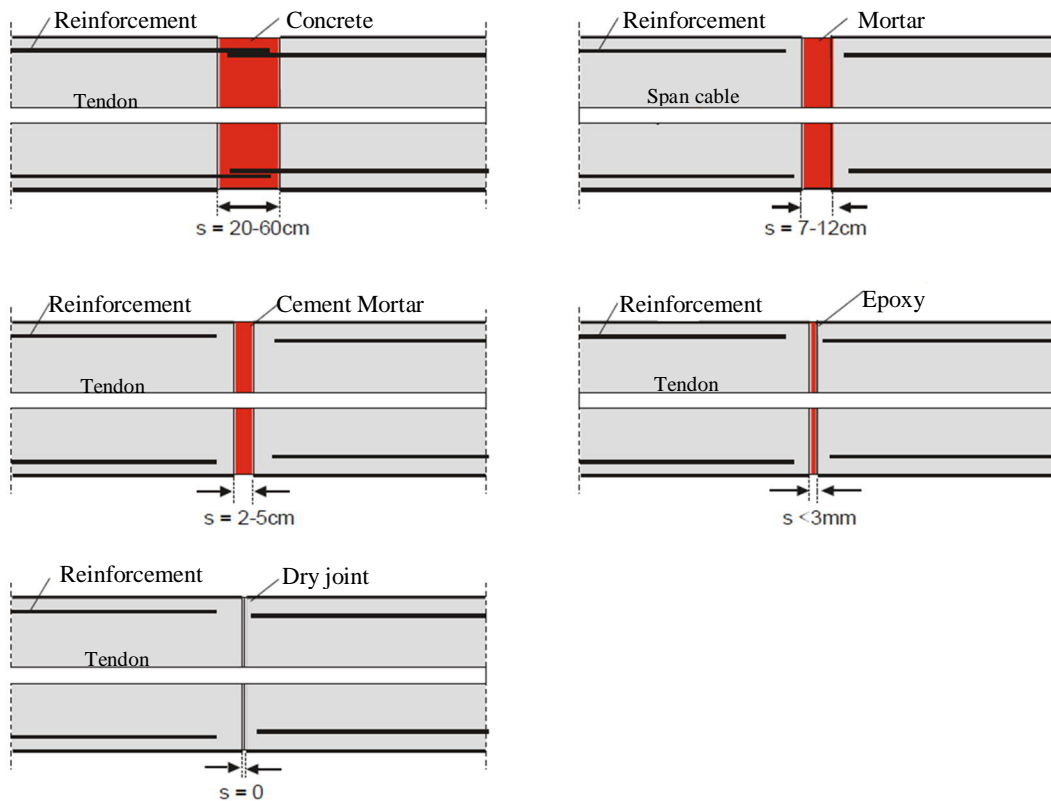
Typical structural joints in bridge construction (Rombach, 2002)
